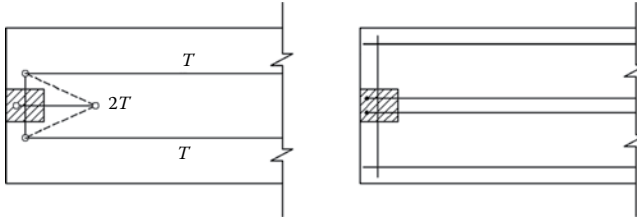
STM* and the corresponding reinforcement of a wide beam-narrow column joint.
